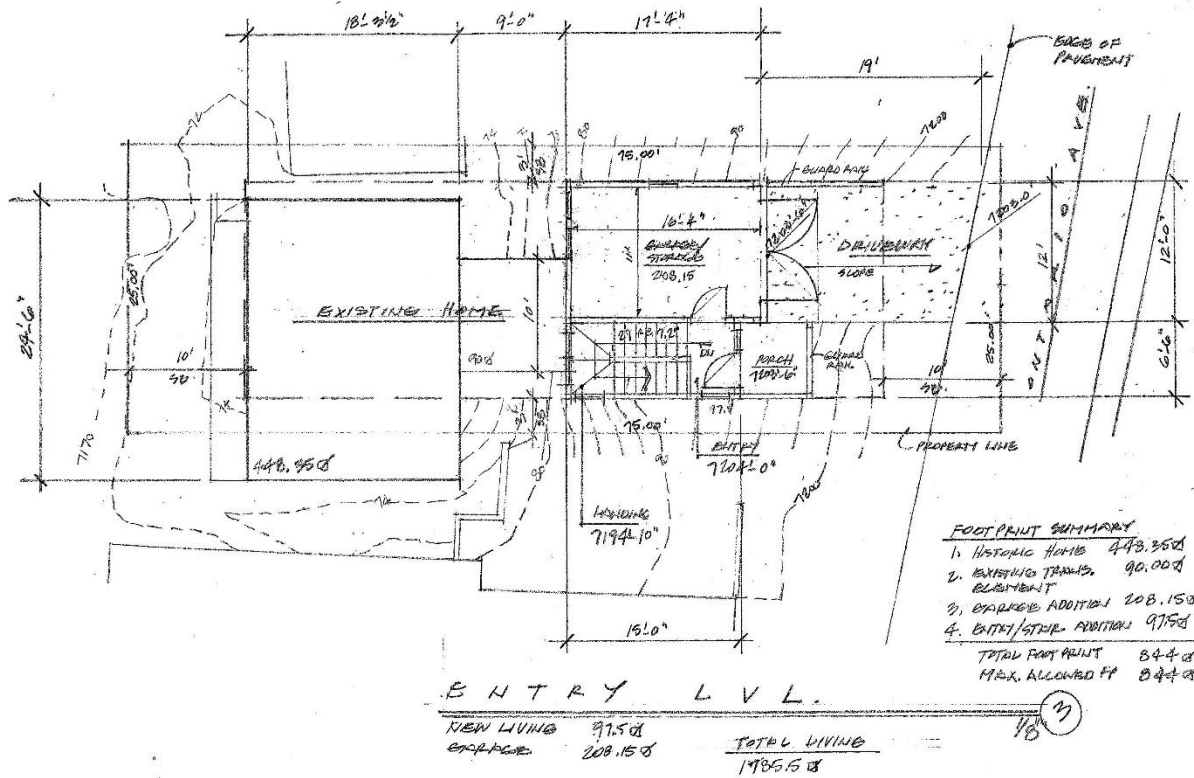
Applicant's Site Plan showing internal dimensions of proposed garage addition.
